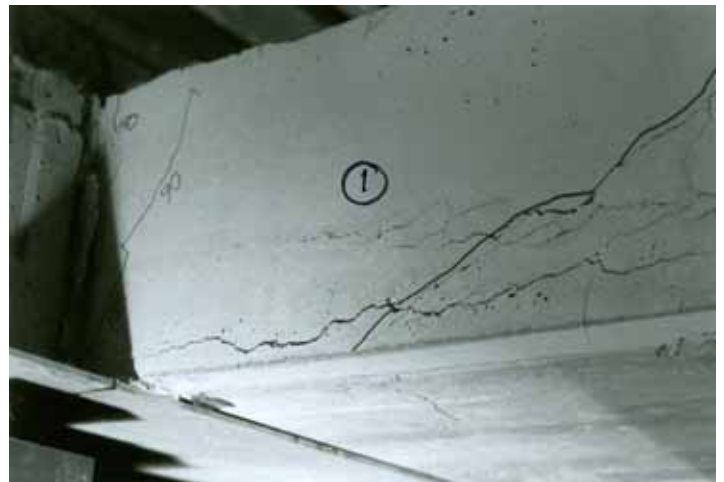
Detail of slab unit 1. Note the transverse crack in the soffit.
